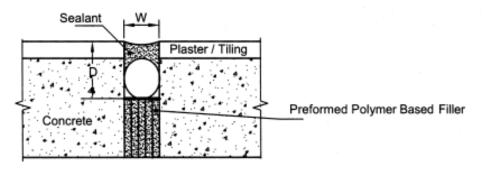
TYPICAL INSTALLATION DETAILS—Continued
